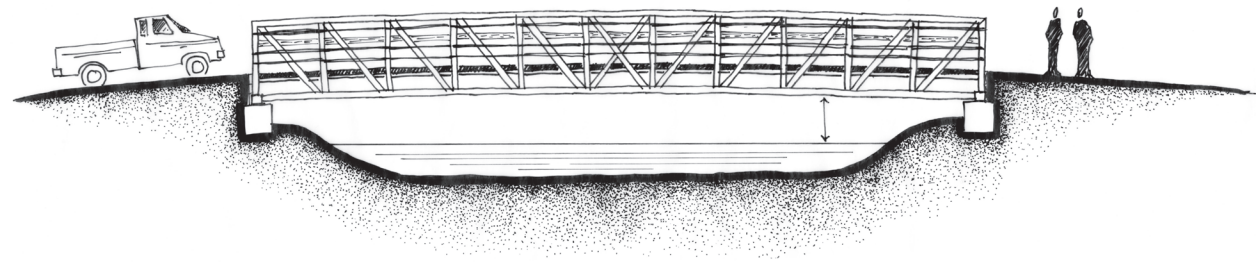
A prefabricated steel truss bridge can be designed to accommodate emergency and maintenance vehicle traffic in addition to pedestrian traffic.
